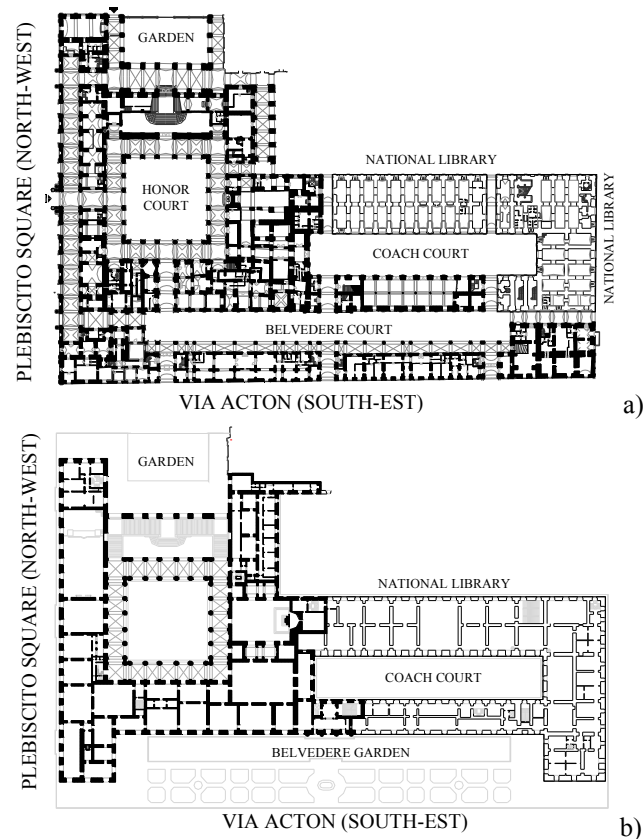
The Royal Palace of Naples – Horizontal sections: a) Ground floor; b) First floor; c) Second floor. (continues)
